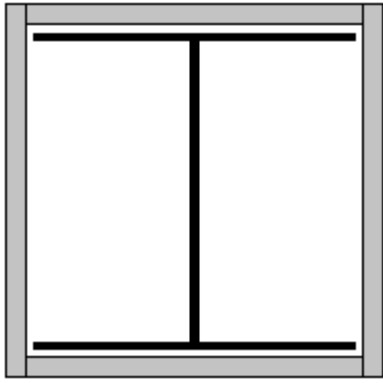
Steel H-profile clad in gypsum for fire protection, after Gyproc Firesafe (2008).
